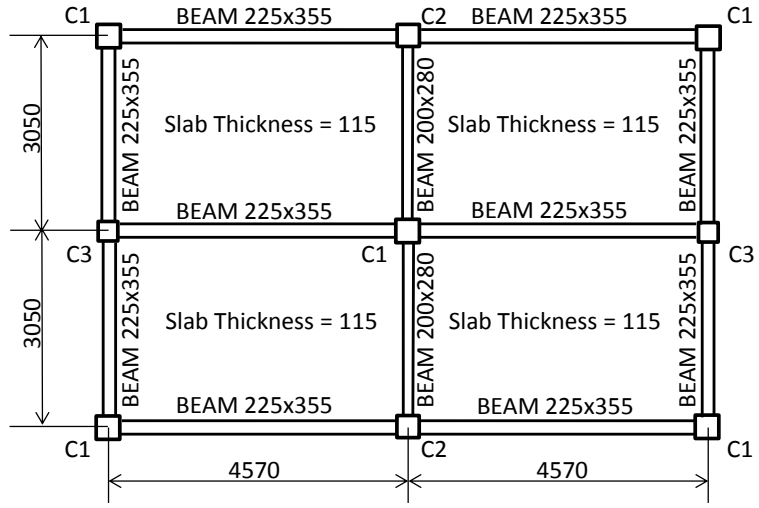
Plan view of 2-bay by 2-bay floor system (units in mm)
